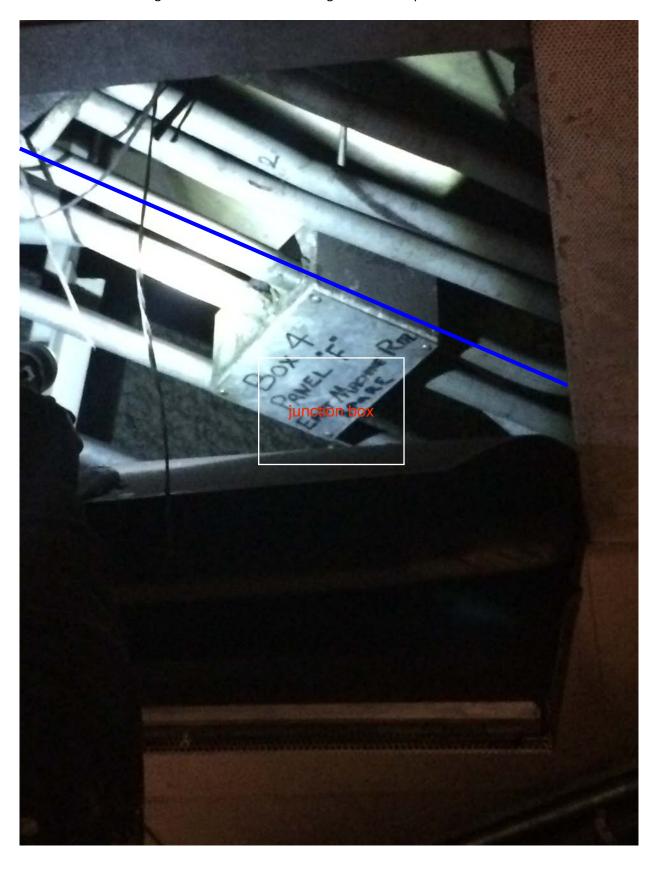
G01 Benning Road: Conduit run from junction box inside AFC panel room
